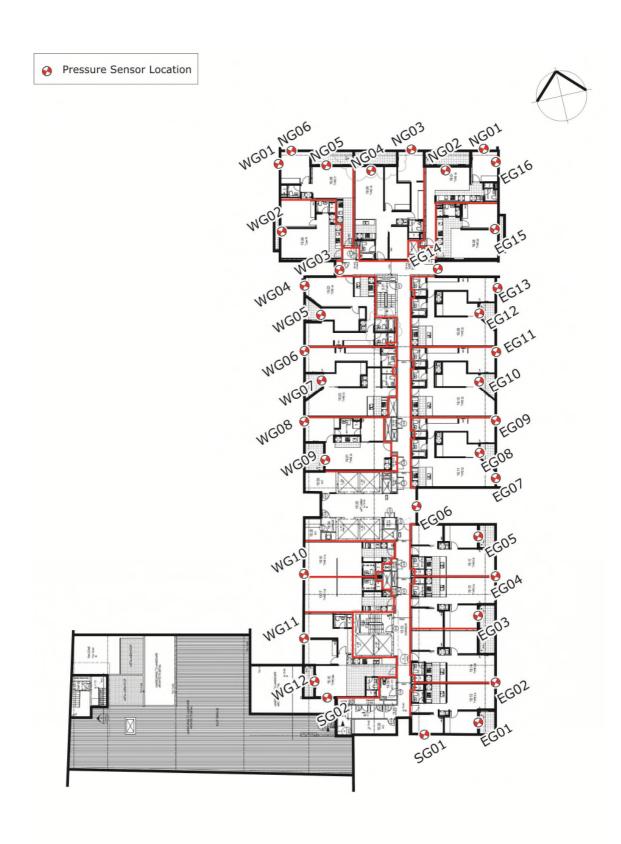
Opening Locations and Internal Apartment Layout - Level 19
